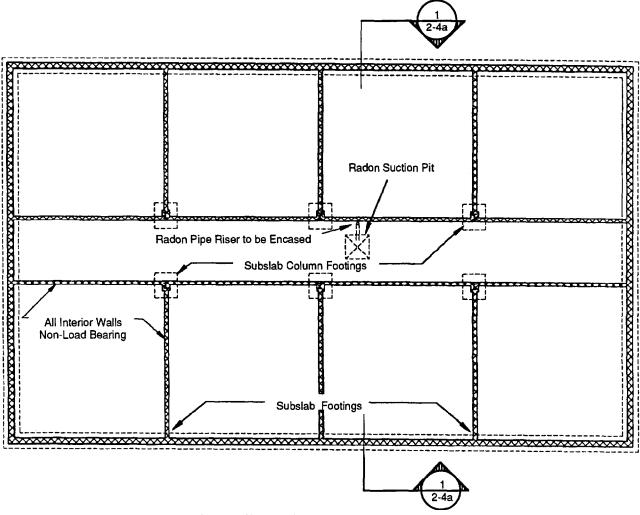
Outside walls and post load bearing. Not to scale.
